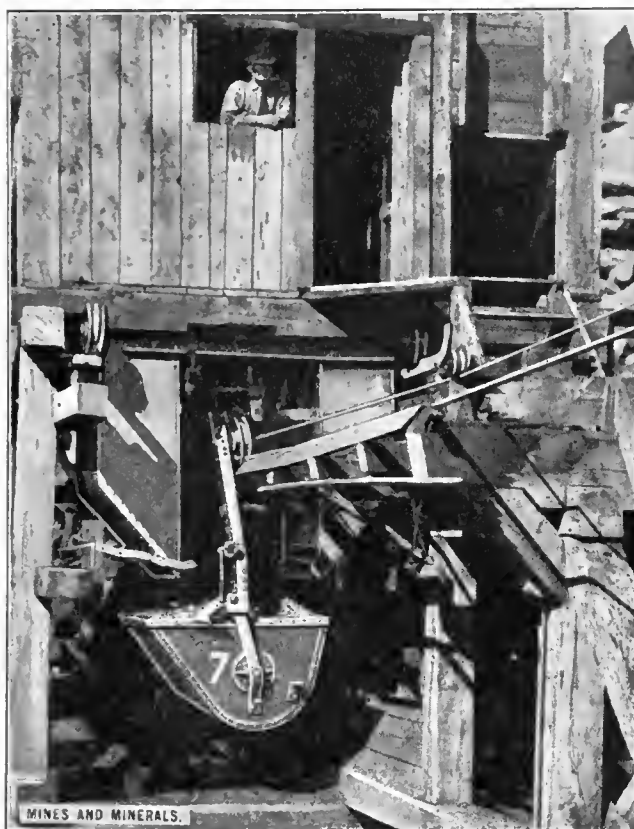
LOADING STATION, AERIAL TRAMWAY
